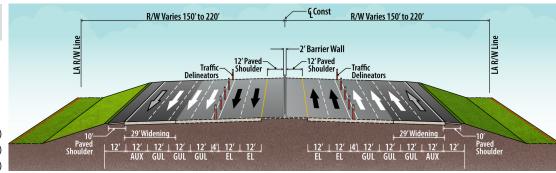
Segment C - Gandy Boulevard to north of 4th Street North Typical Sections
